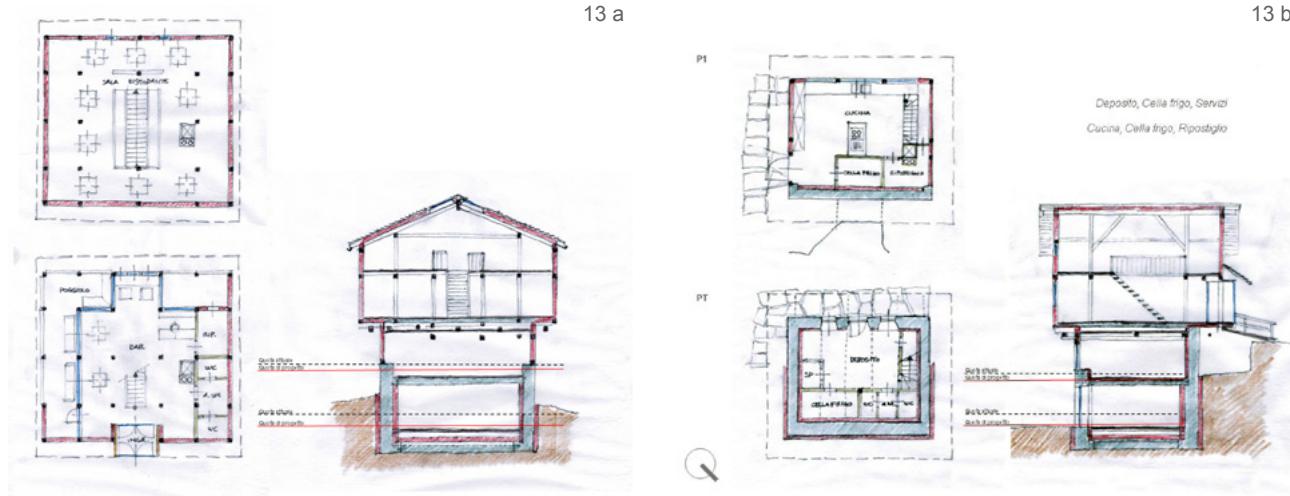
a-b project proposal - plant and sections/ proposition de projet: plantation et section
